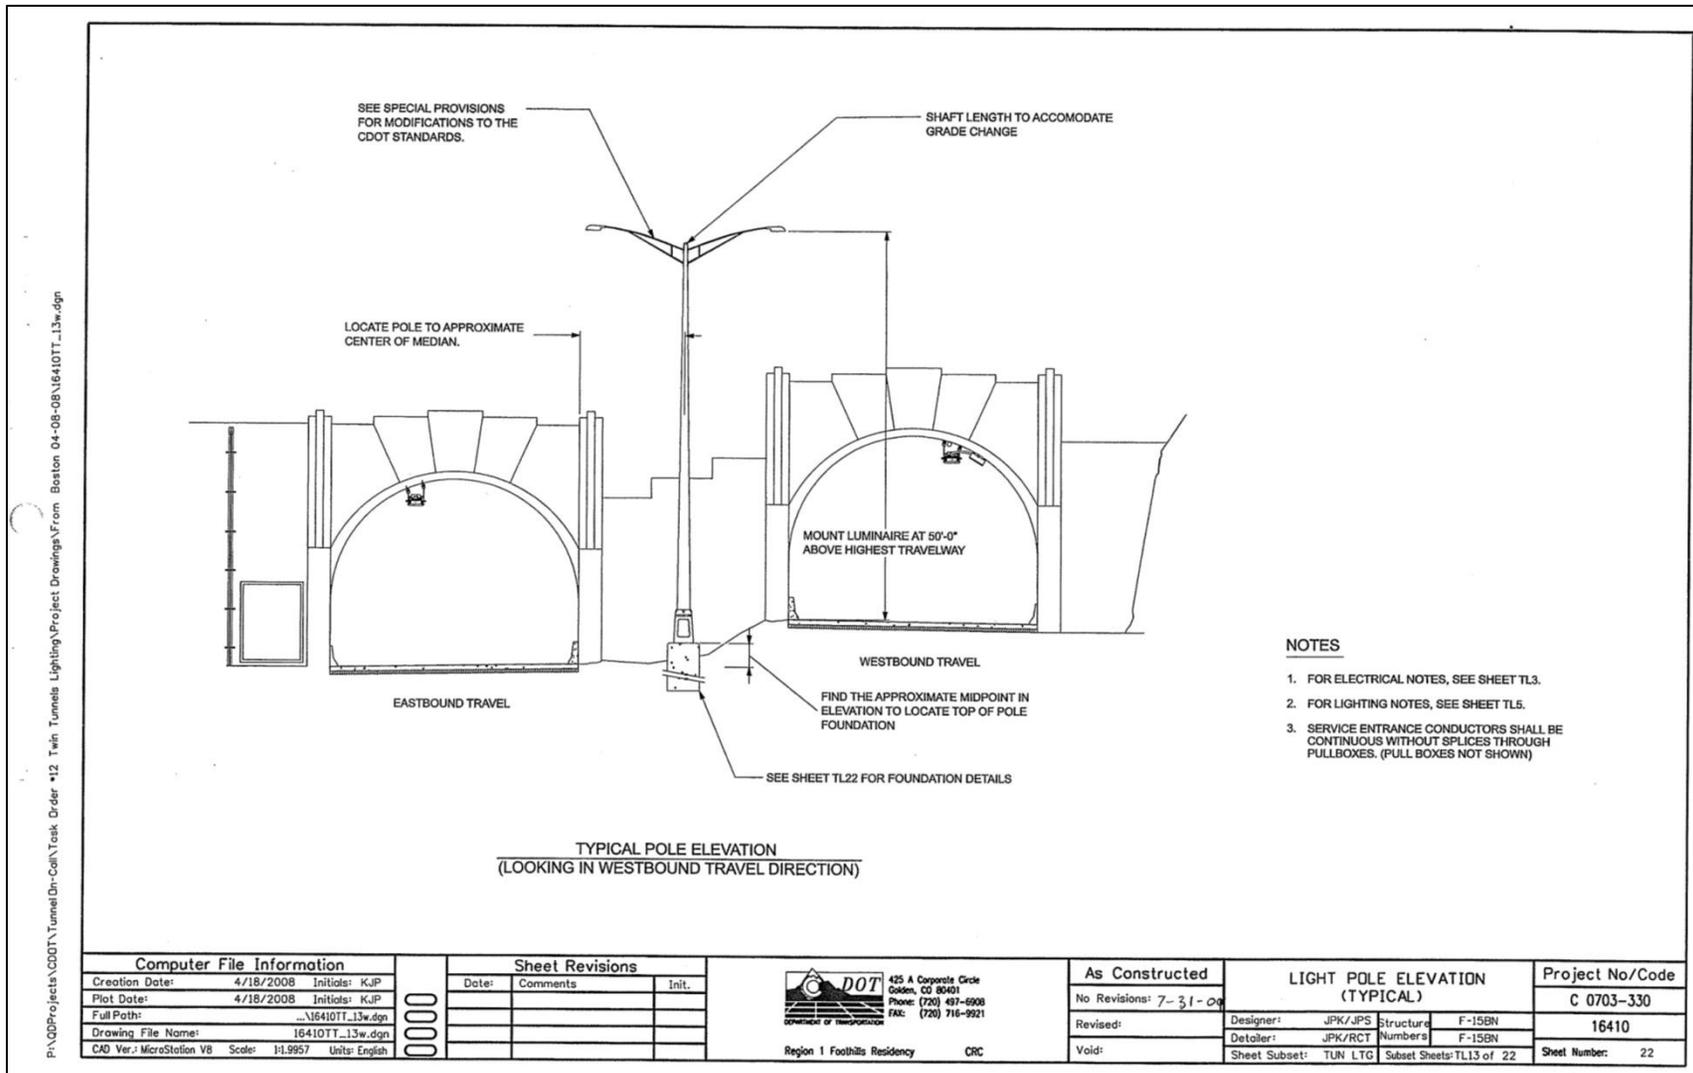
Twin Tunnels Lighting Upgrade As Built Plans (Sheet 22). Typical tunnel-pole elevation for high-mast lighting.
